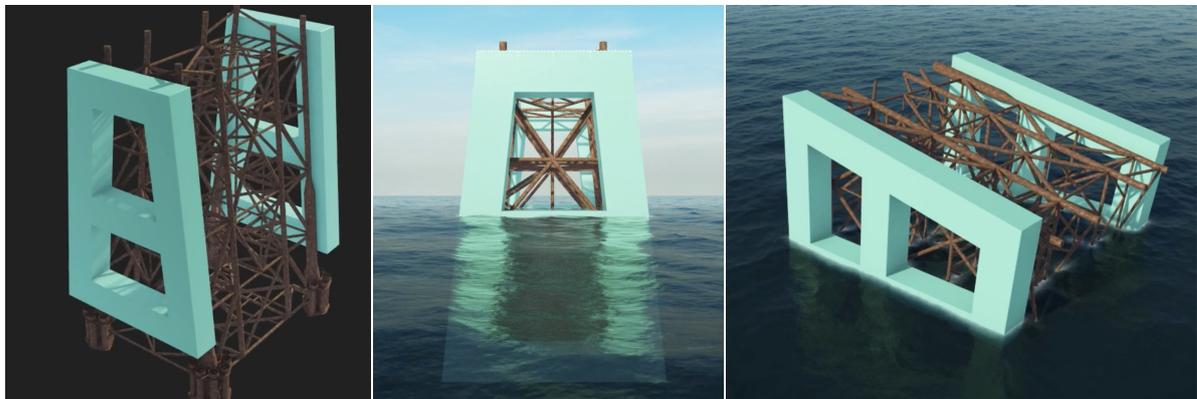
The External Buoyancy Caissons as designed for the BP Miller jacket are able to float the structure, tow vertically and rotate horizontally in order to enter the shallow dismantling yards. *Pictures from Ardent
